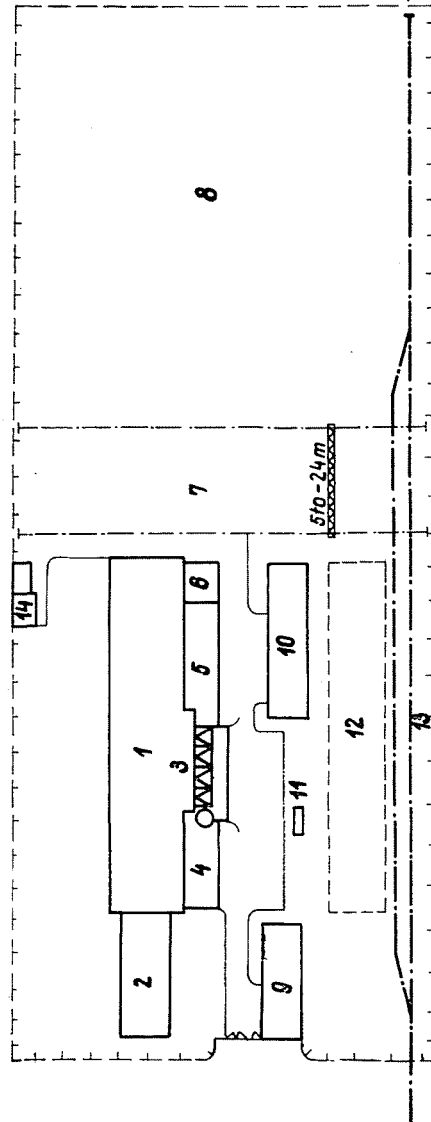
General layout of a prestressed concrete sleeper manufacturing plant.
